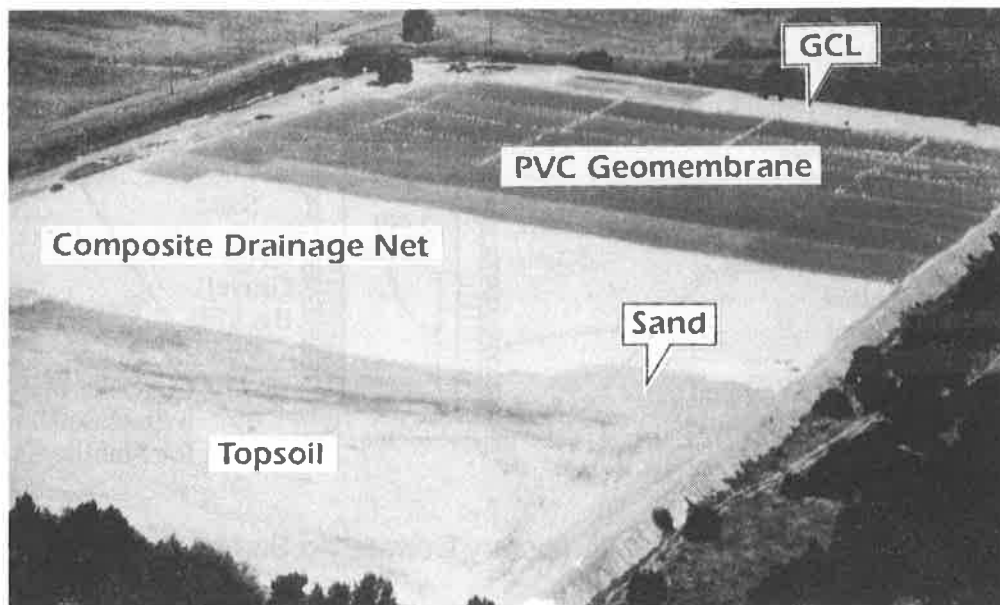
Cover under construction. From background to foreground, the GCL, geomembrane, composite drainage net, sand, and topsoil are visible.
